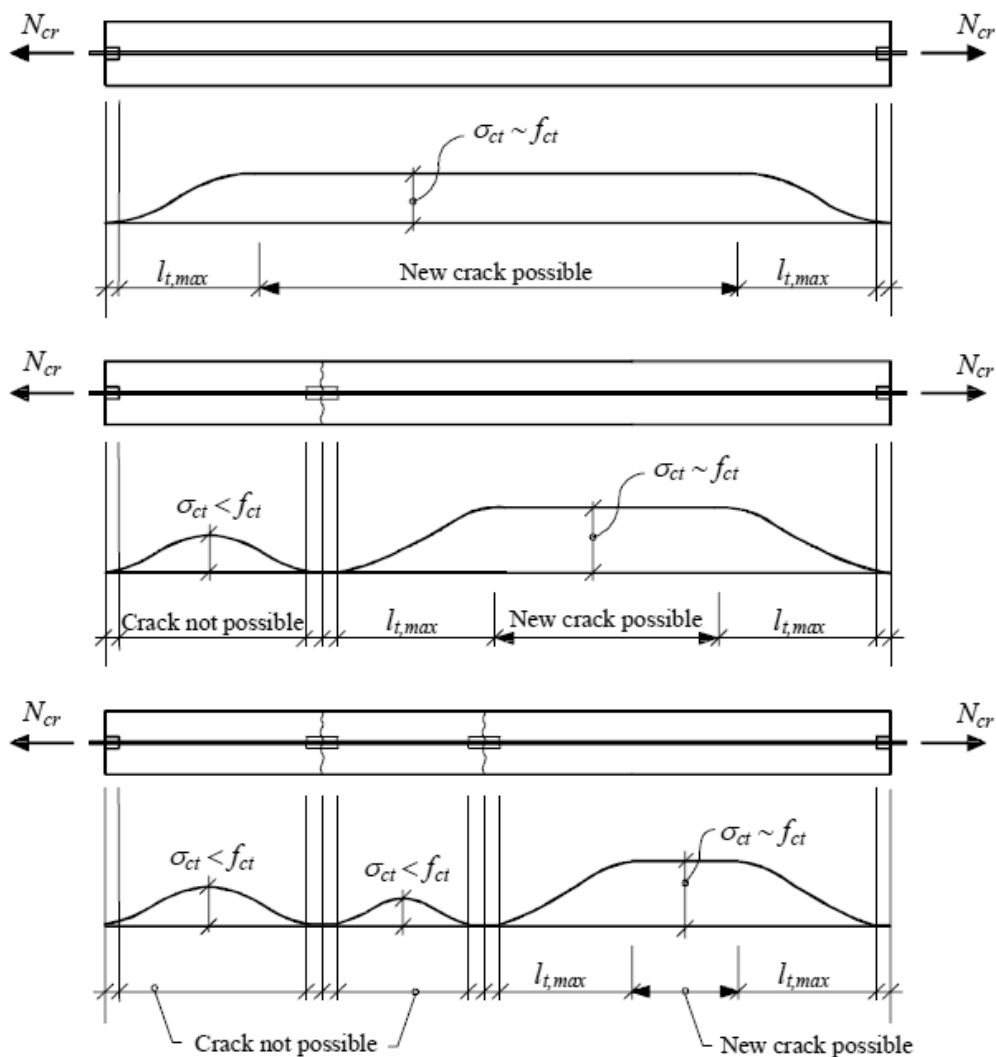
Cracking process of a reinforced concrete member axially loaded in tension. From Engström (2008).
